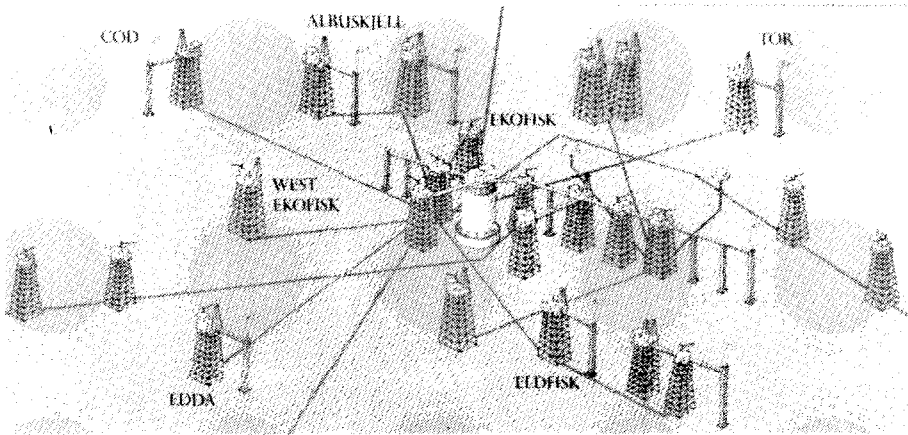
The 2/4 Storage Tank with lay out of adjacent platforms and network of pipelines
